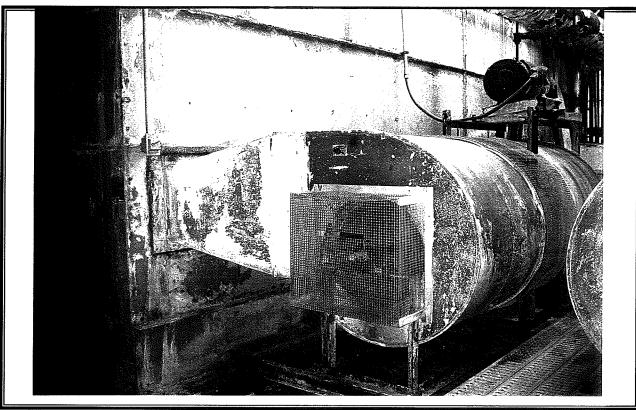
Photo Date 12/05/06 Midtown Tower - Main Chiller Plant One of 4 cooling Towers
